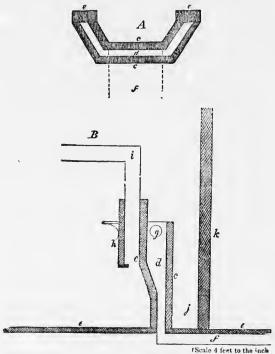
Plan of School Fireplace, with Horizontal Section.
